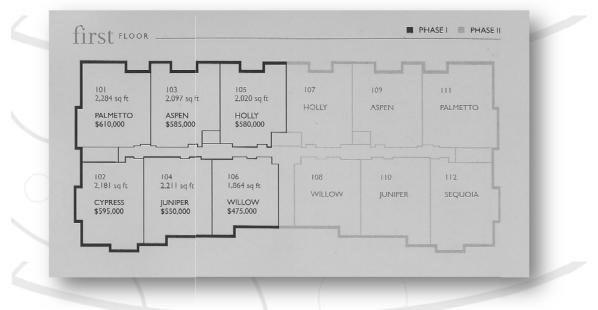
First Floor Phase 1 and 2 – Wellington Commercial Construction
